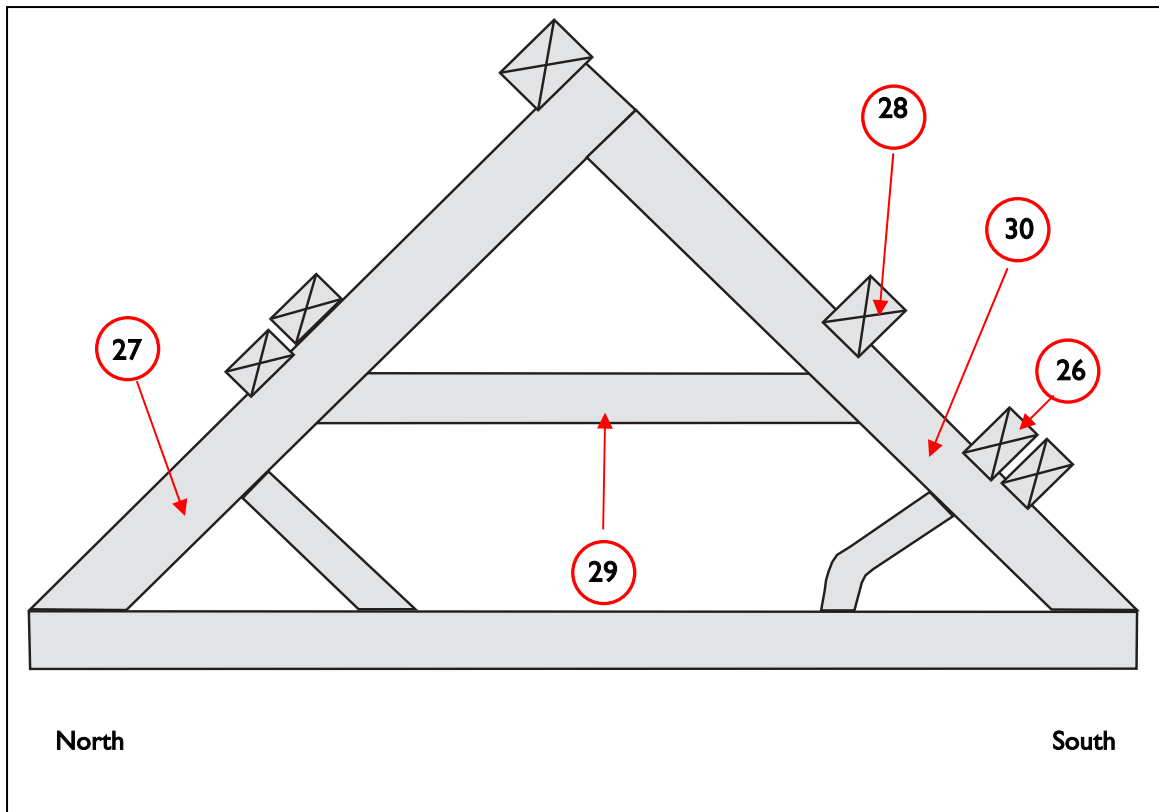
House A – schematic section of west wing central truss to show sampled timbers (viewed from the west looking east)
